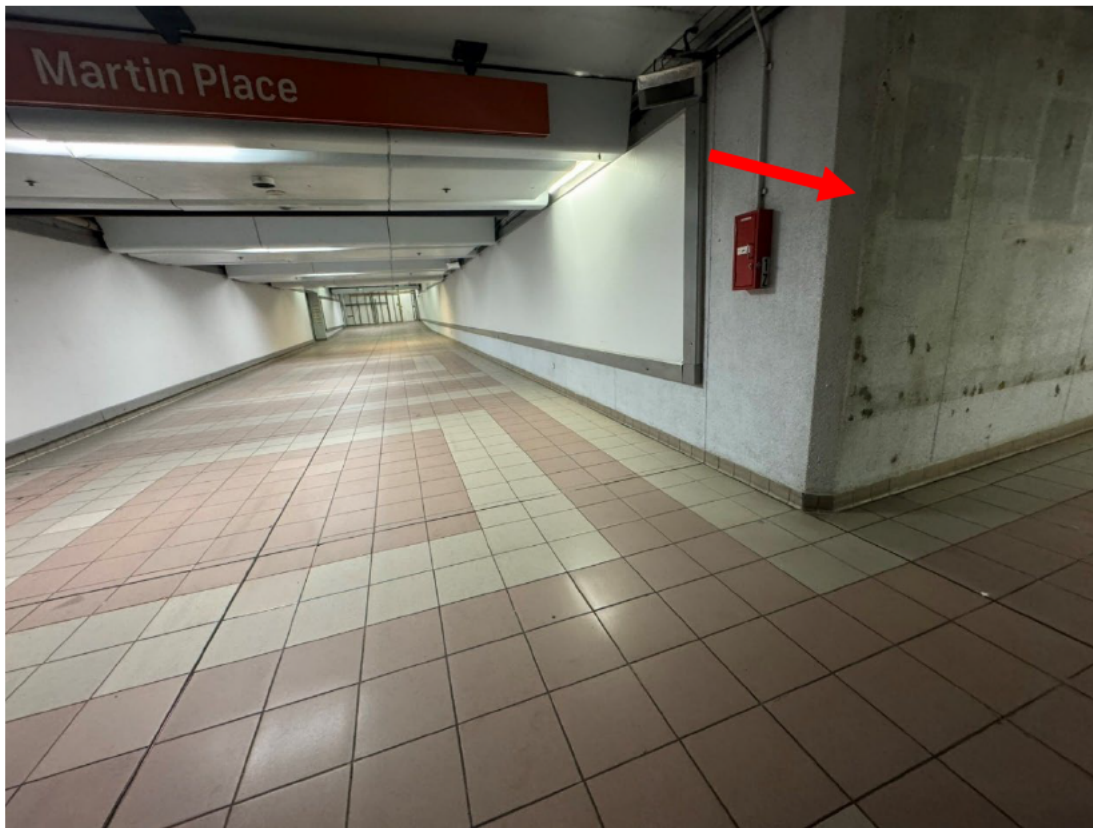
Location of proposed entrance to store room - block wall with double doors fixed to existing concrete walls. Source: OCP 2024.
